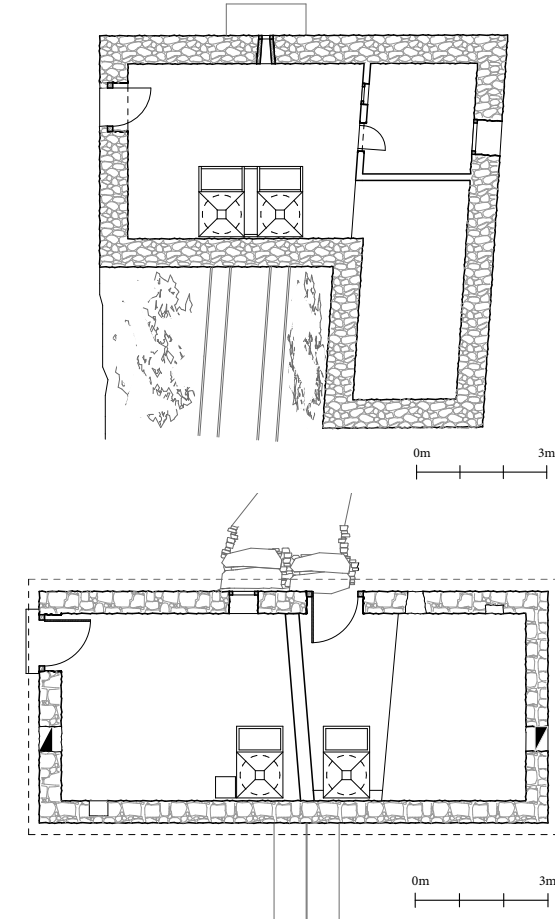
Floor plan, Mill of Sylëregja Family, Vranoc, Peja
